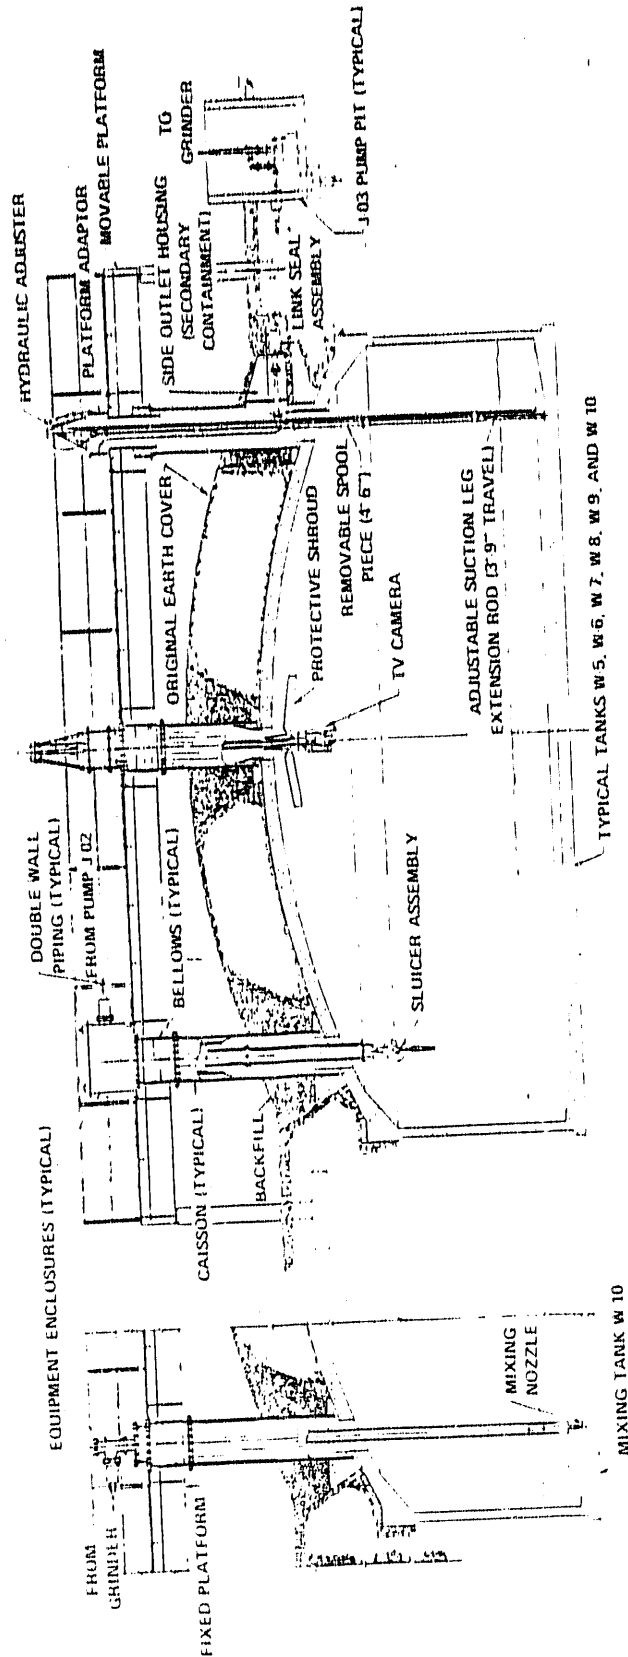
Schematic view of Gunite Tank construction showing sludge removal equipment.
